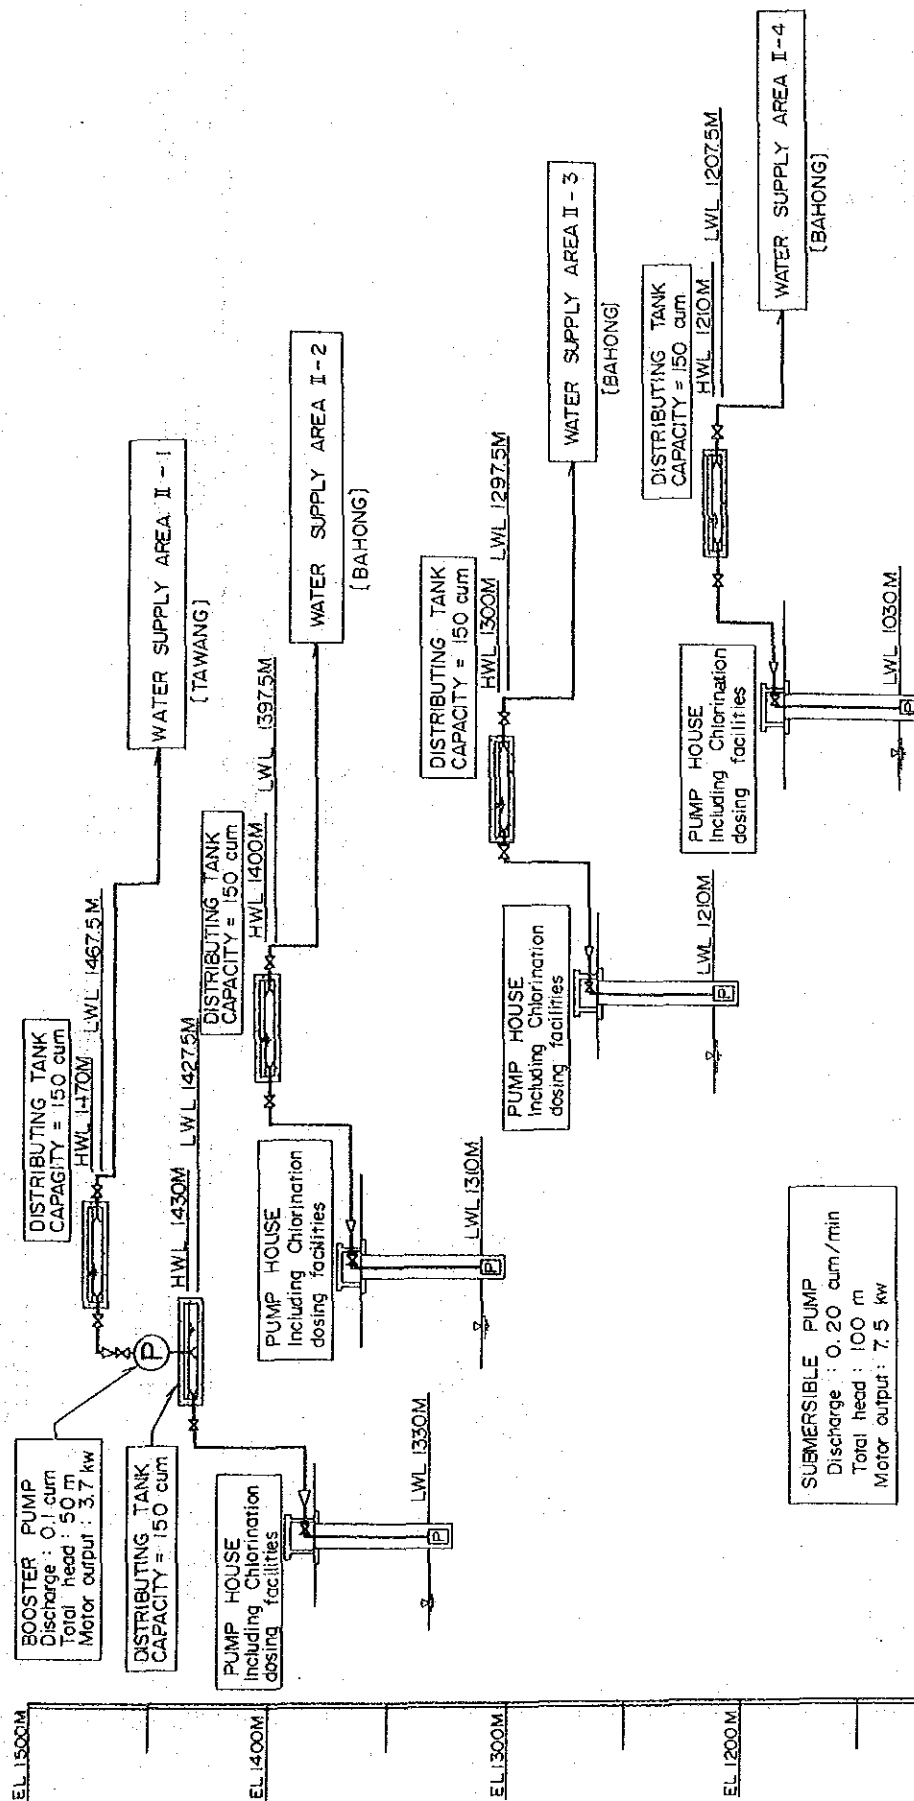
Plan of Water Supply Facilities ( Zone II ) ( 1 / 2 )
